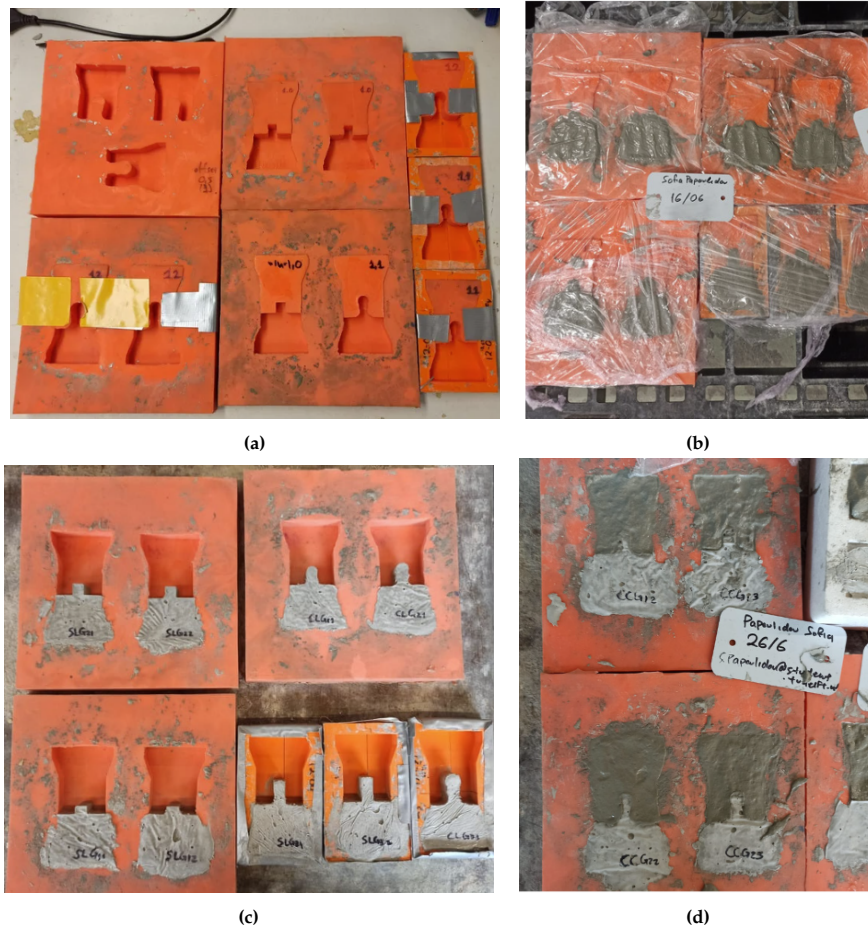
SHCC casting: (a) mould preparation, (b) casting of bottom parts, (c) mould preparation—removal of excessive material & (d) casting of the top part
